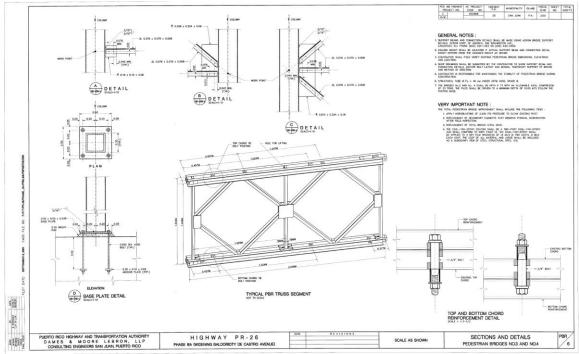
Bridge Drawings 2001 – Sheet 6
